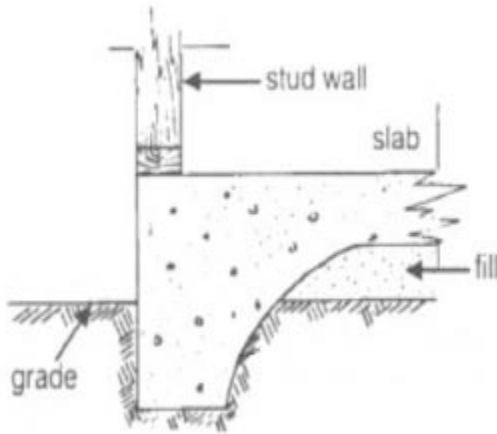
Monolithic slab foundation (illustration courtesy of MSUE)
